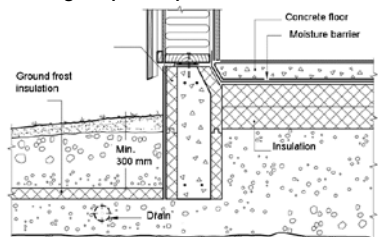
Detail avoiding thermal bridge and air leakage at the wall/slab-on-ground junction [© SINTEF]
